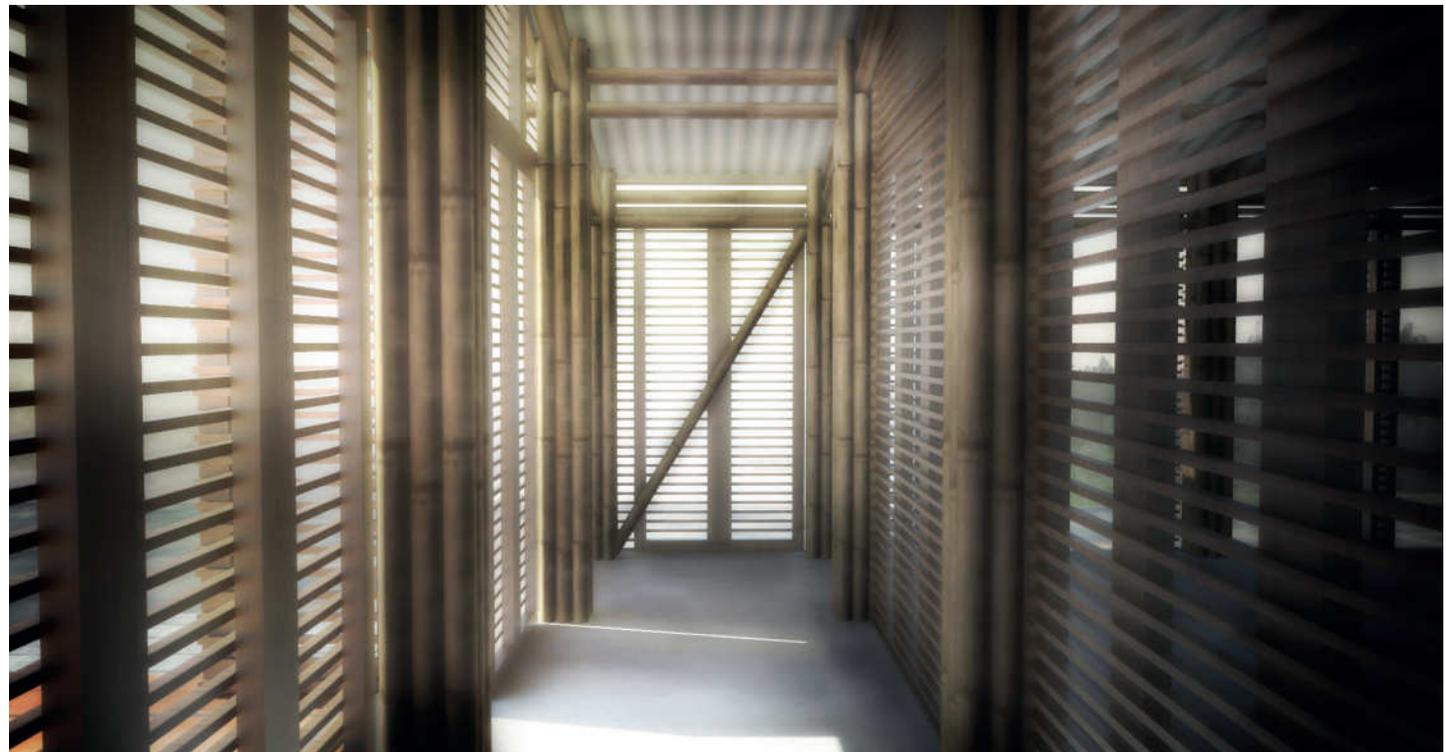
VISUALIZATION OF THE DOUBLE FACADE AND CORNER CROSS BRACING
